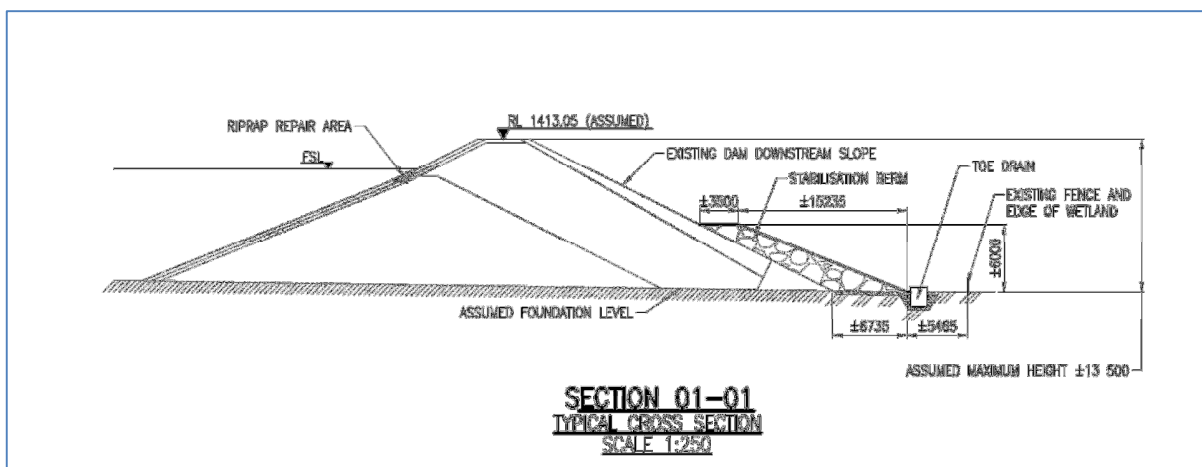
Typical Cross Section of the Dam Repair Works as proposed
